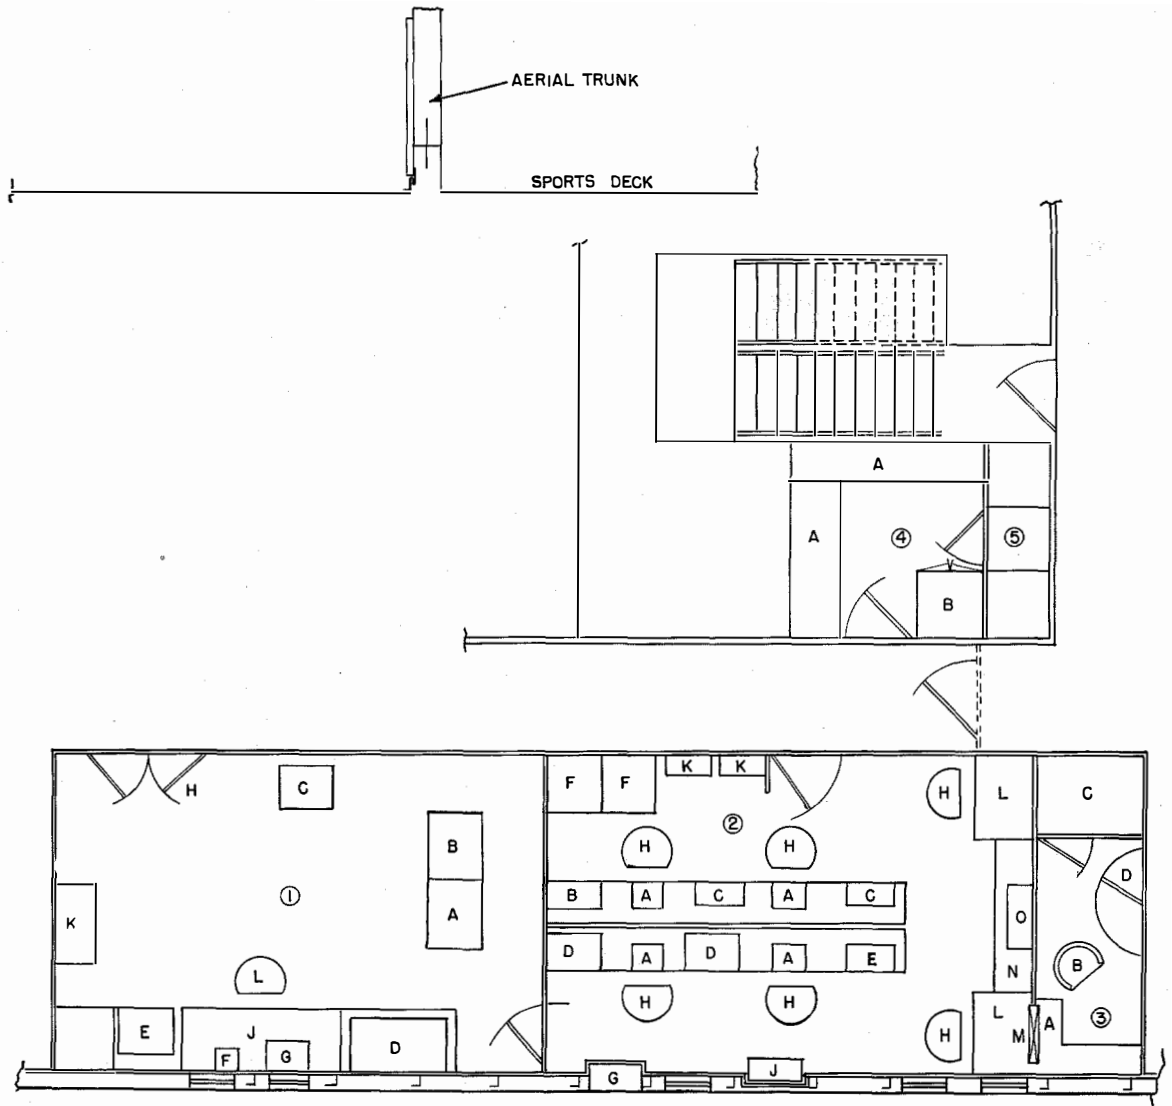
Layout of radio equipment in five rooms on the sun deck just abaft the bridge.
